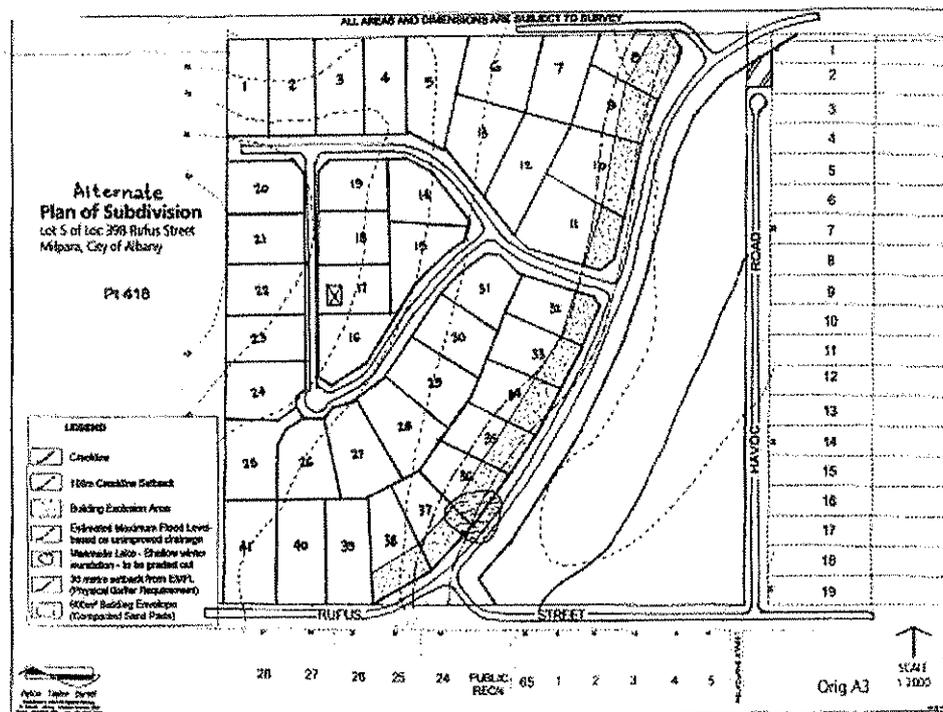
Alternate Subdivision Guide Plan – Special Residential Area No.7 - Lot 5 Rufus Street.
